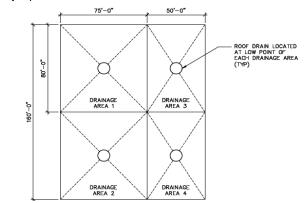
Plan View of Multi-Directionally Sloped Blue Roof
